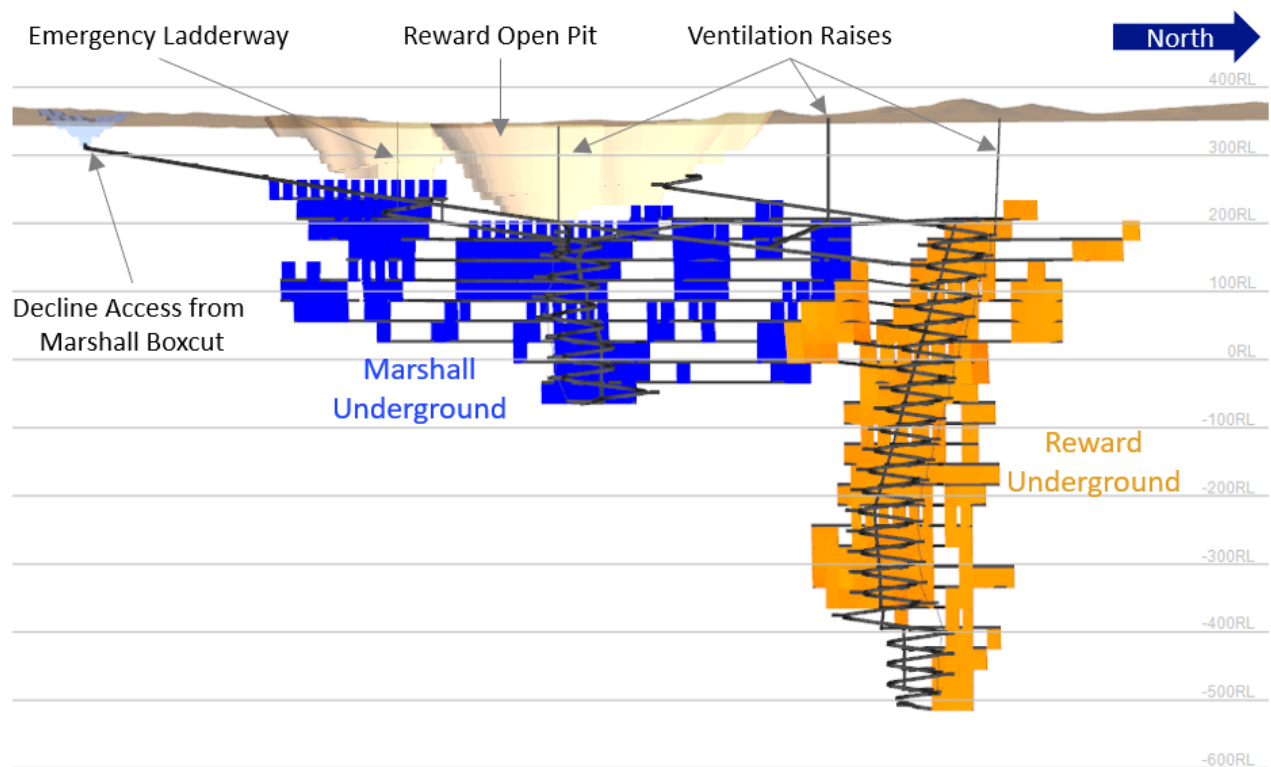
Reward Open-cut, Marshall Underground and Reward Underground Layout – Looking West
